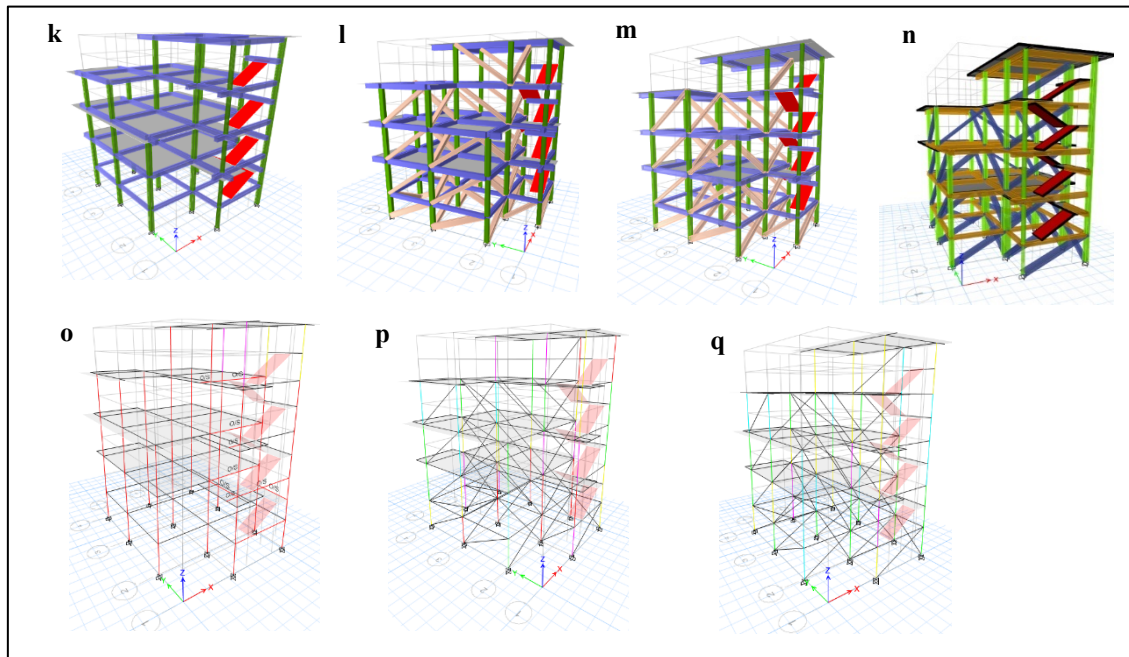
Structural simulation Etabs model:In bare frame (k), brick infill wall frame (l), EPS wall panel frame after energy retrofit (m),column retrofitted model (n), Failure of column and
